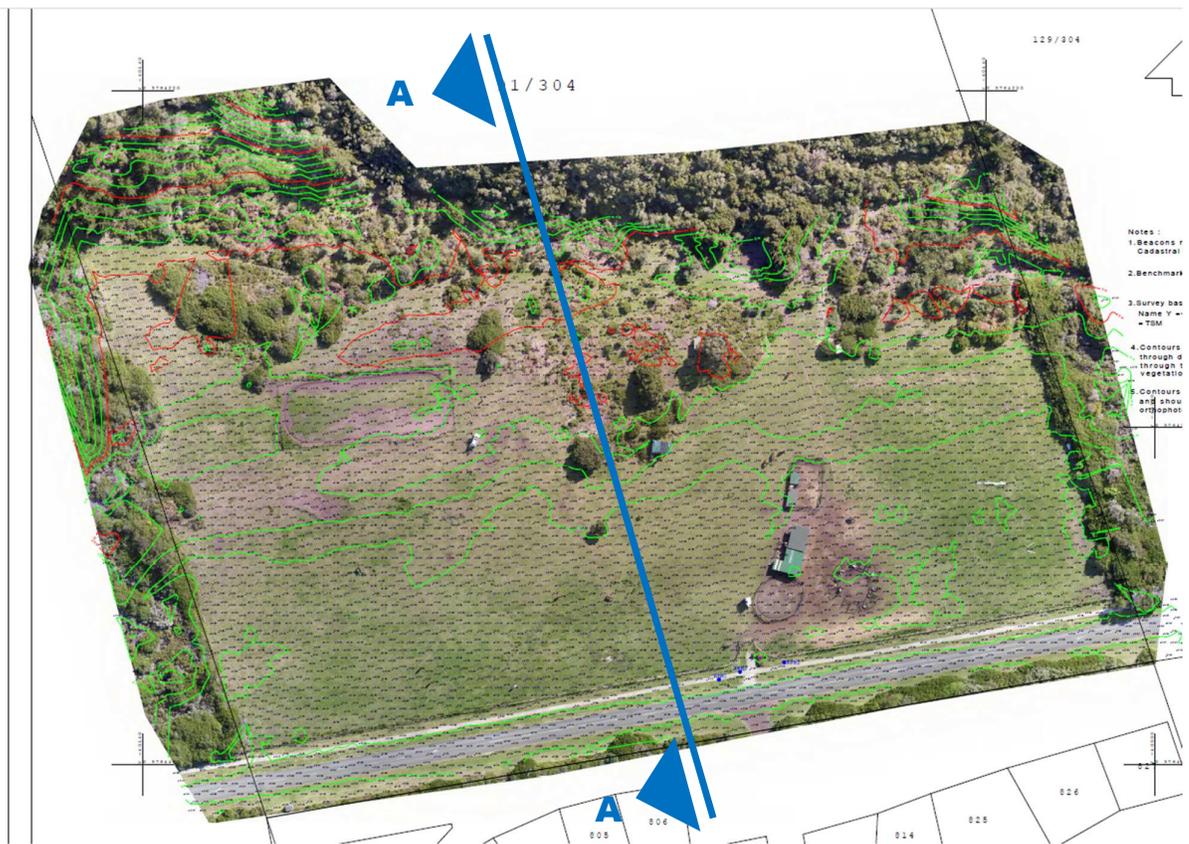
A: STORMWATER: ARIAL VIEW OF SITE AND SECTION A-A
